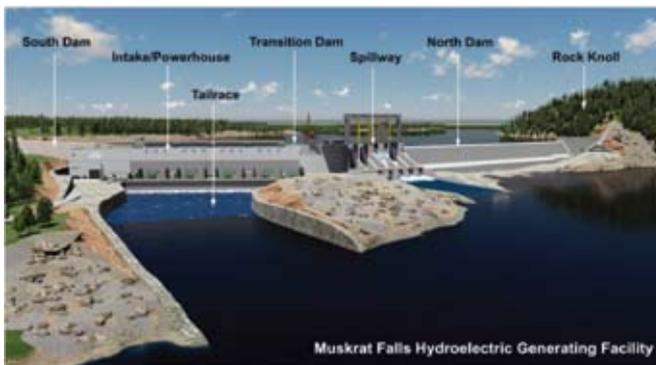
Muskrat Falls generation facility – Water retaining structures.
